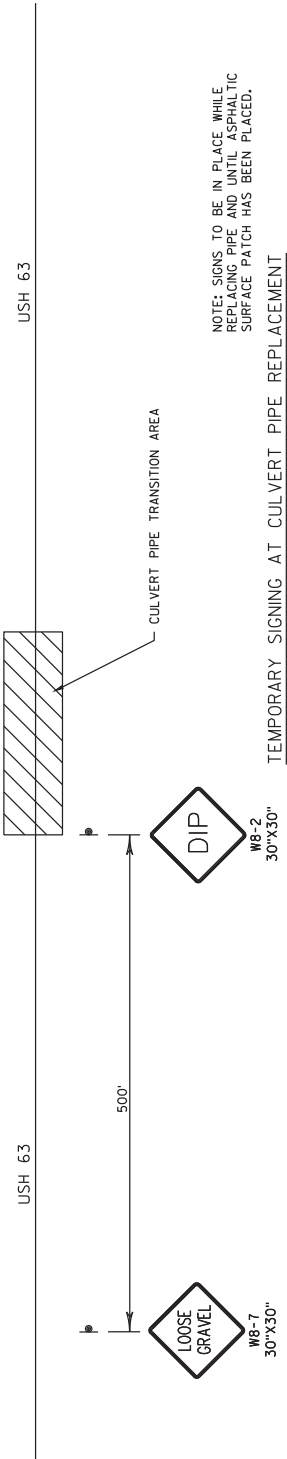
CULVERT PIPE REMOVAL, REPLACEMENT AND BASE PATCHING INSTALLATION
